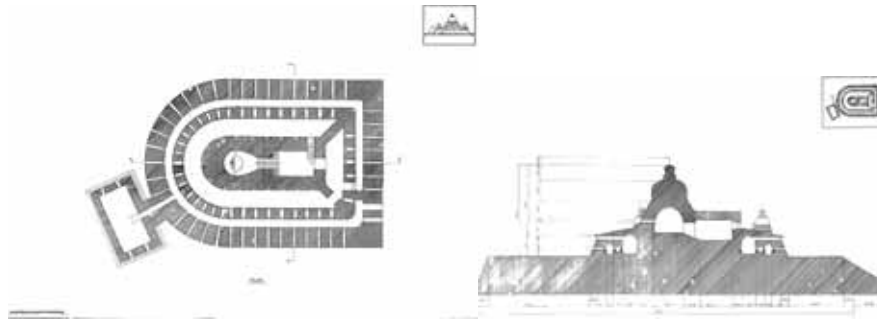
Ground floor plan and cross section of Htuk-Kan-Thein temple
